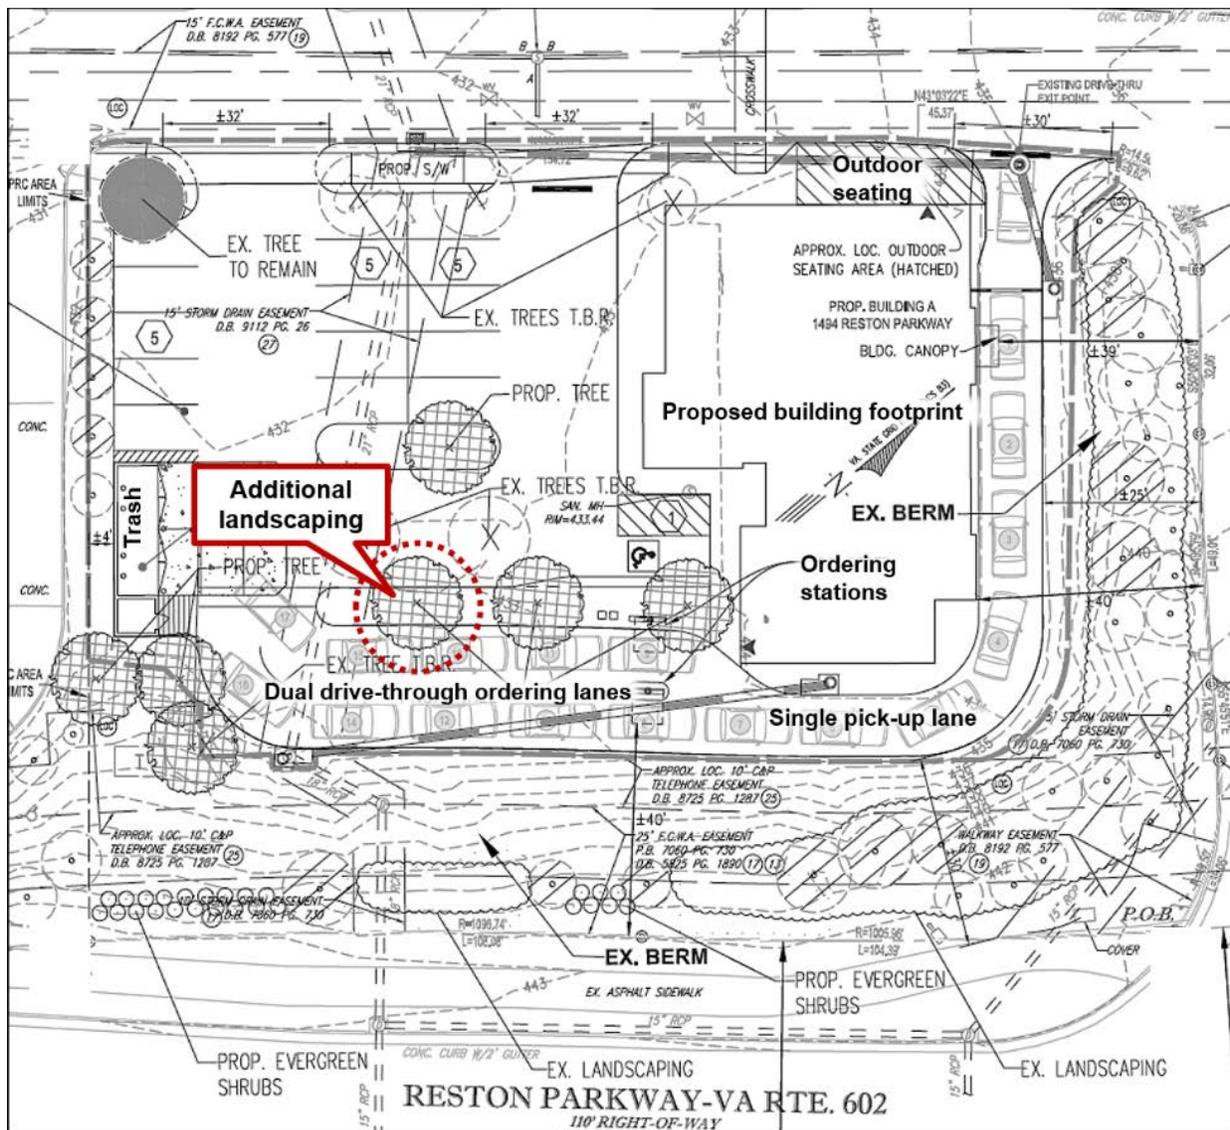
Additional landscaping, Source: Sheet 12 of PRC Plan
